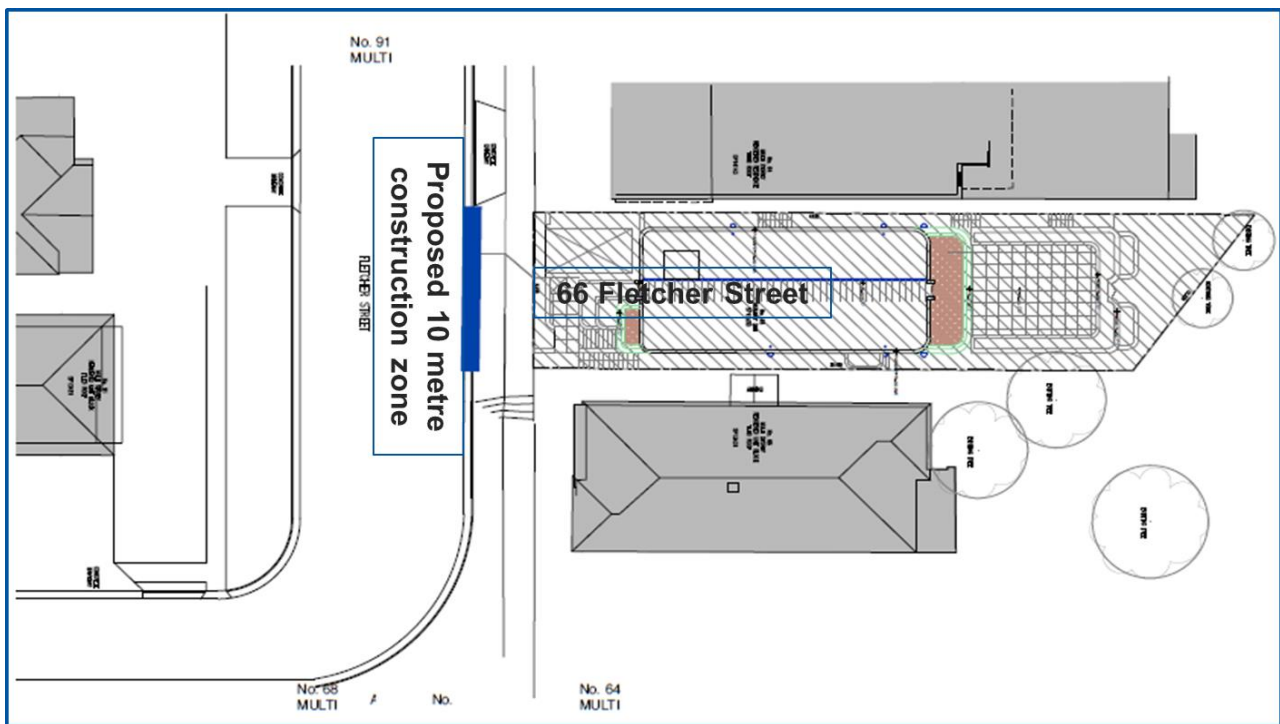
Proposed construction zone at 66 Fletcher Street, North Bondi.
